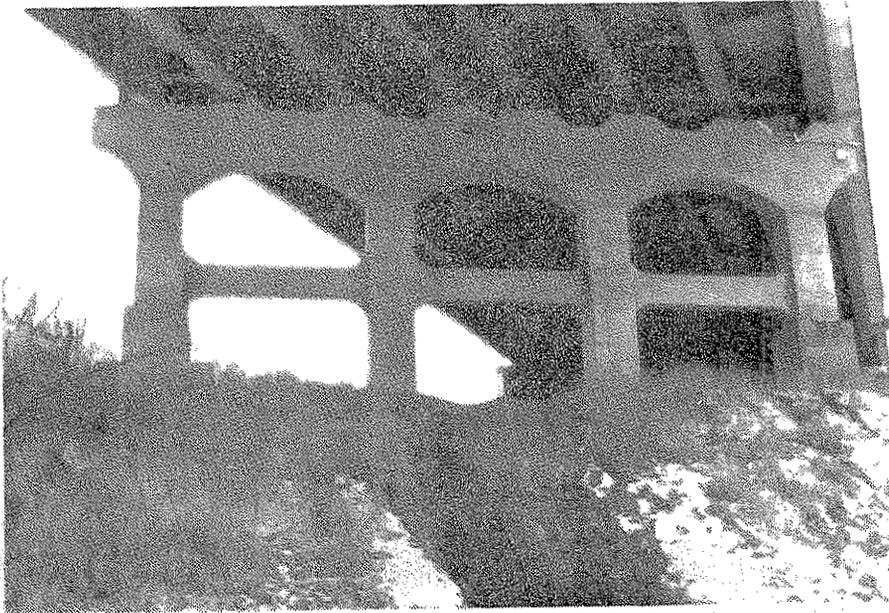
Elevation of the Karl King Bridge (looking north, upstream).
